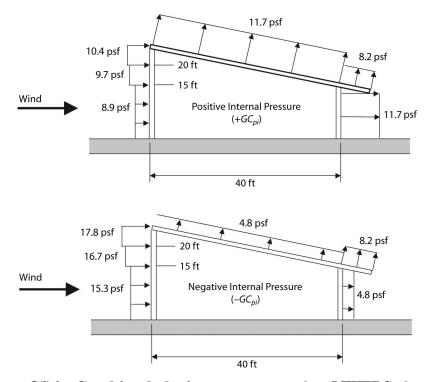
Combined design pressures for MWFRS for wind parallel to the roof slope and normal to a 25 ft wall.
